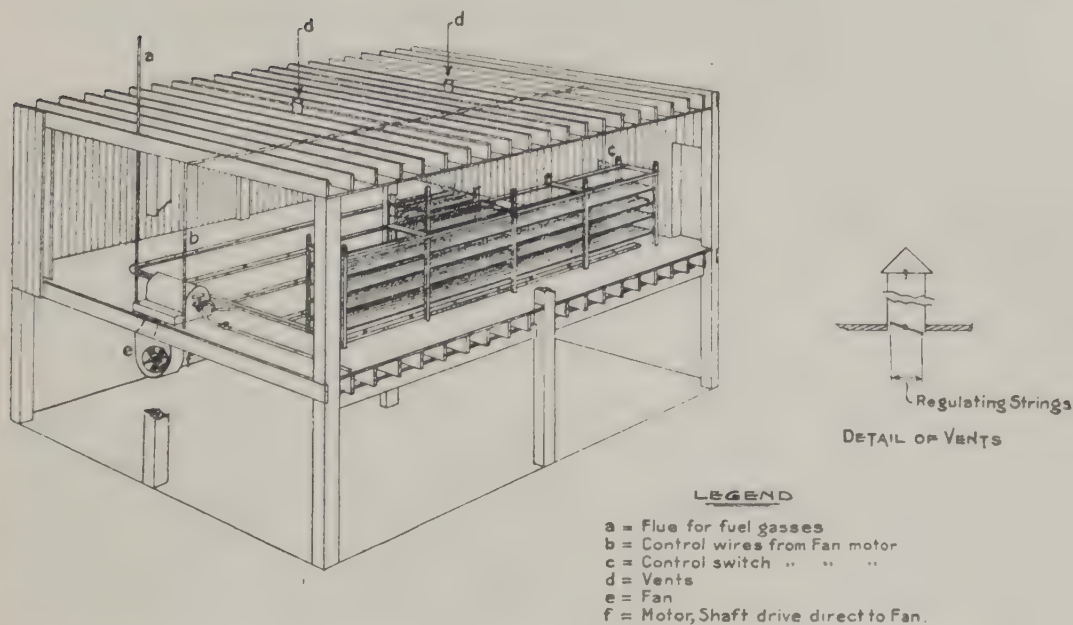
Plan of drying room showing plenum system installed heater for gas consumption.
